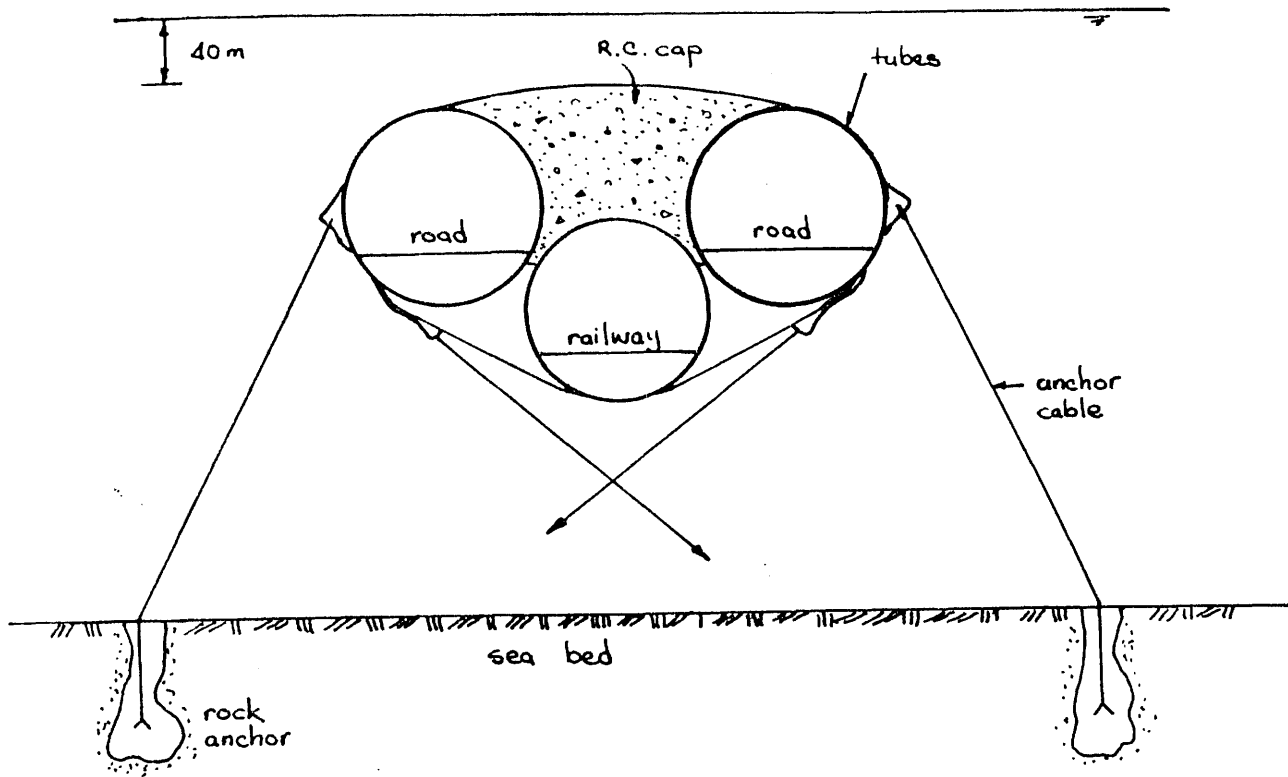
PRINCIPLE OF ANCHORED FLOATING TUNNEL.
